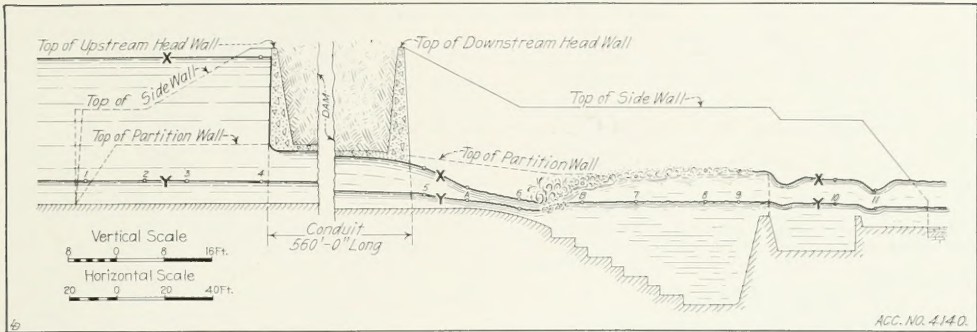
DIAGRAMMATIC LONGITUDINAL SECTION, GERMANTOWN DAM CONDUITS, SHOWING HYDRAULIC JUMP
